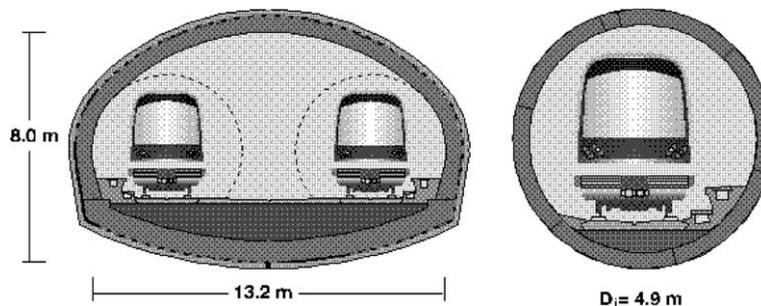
Cross-section of bored tunnel showing cross-over (left) and running tunnel (right).
